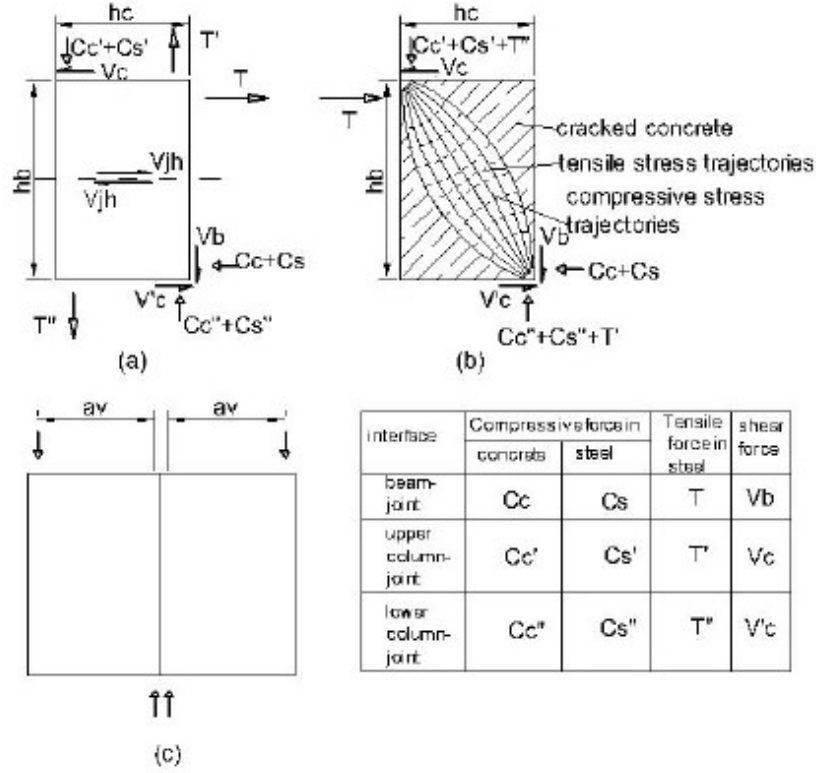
(a) Forces acting at the interfaces of the joint with the beam and column elements and shear force V_{jh} at the horizontal cut at mid height of joint; (b) Compressive and tensile stresses trajectories assumed to develop within the joint at its ultimate limit state; and (c) Deep beam analogy. [9]
